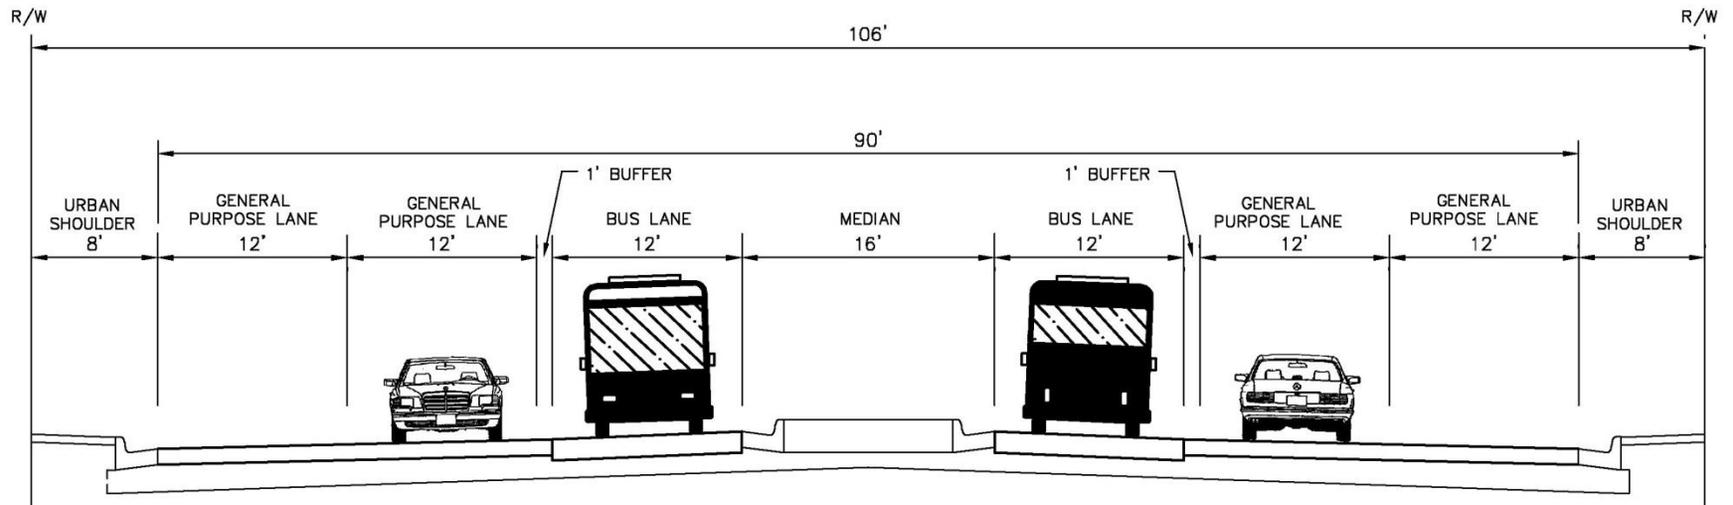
Proposed Typical Section on US 41/Cobb Parkway – Center-Running Dedicated Guideway
